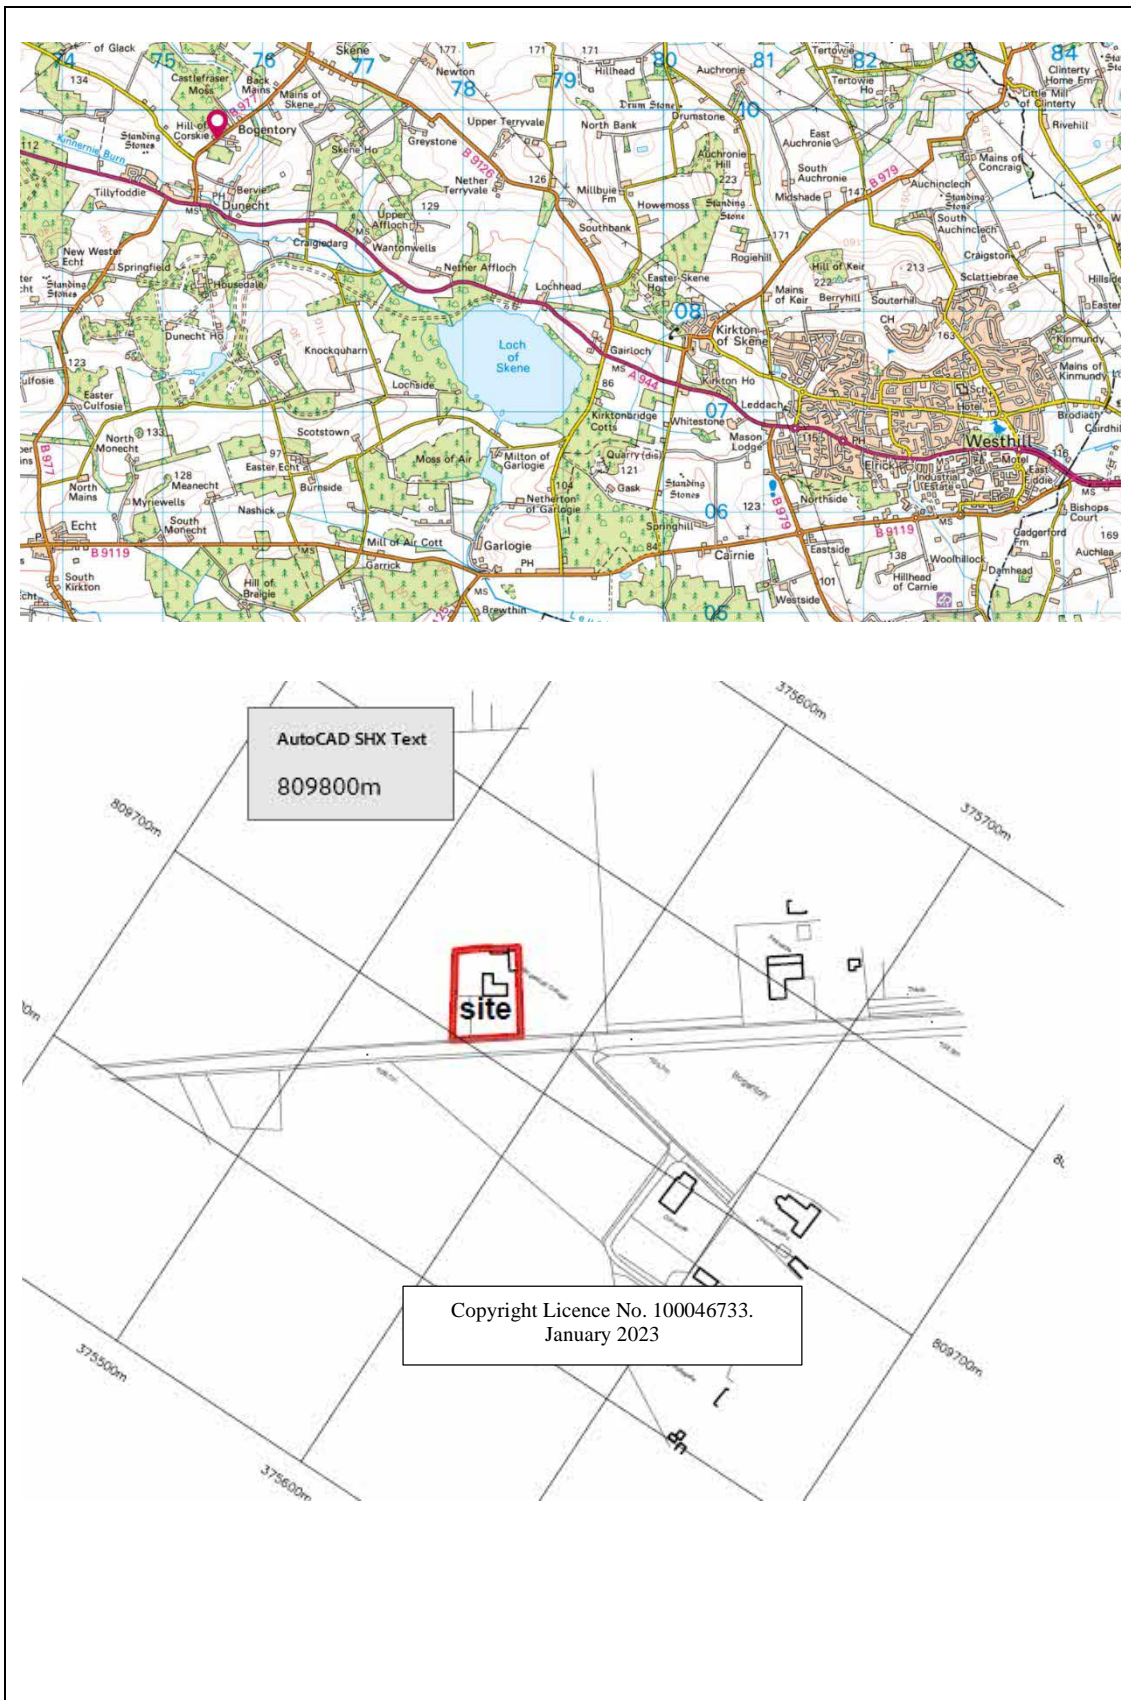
PROPOSED SITE LAYOUT & TEST LOCATION PLAN
